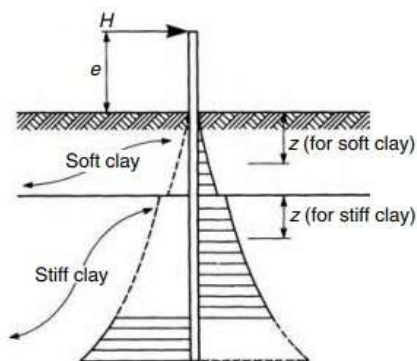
Reactions in layered soil on vertical pile under horizontal load
